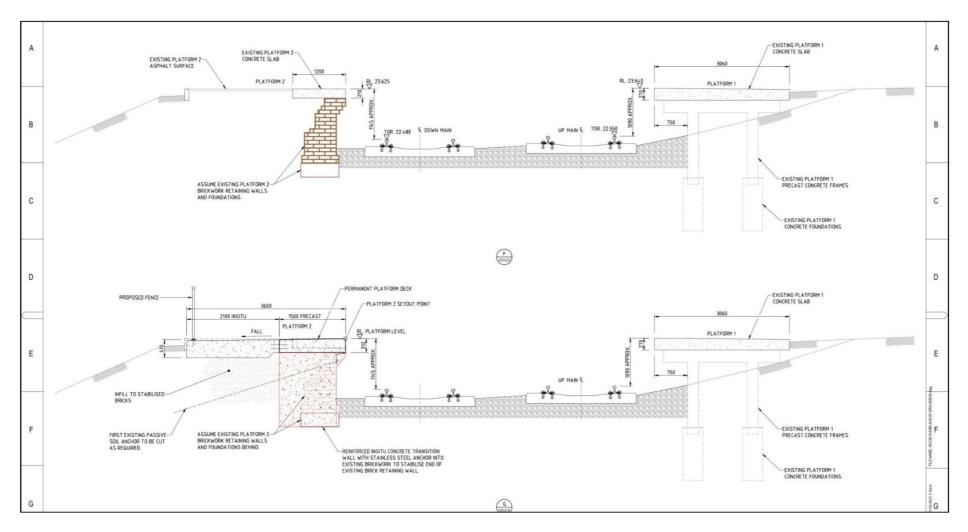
Section plan of proposed Austinmer Station platform extensions (Source: Transport for Tomorrow 2025)
